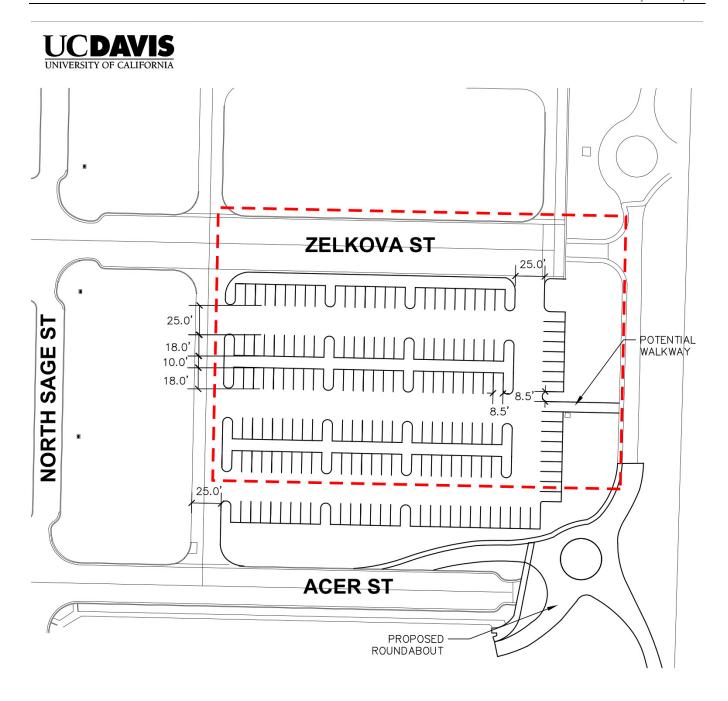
Orchard Park Redevelopment Project – Offsite Parking Plan
